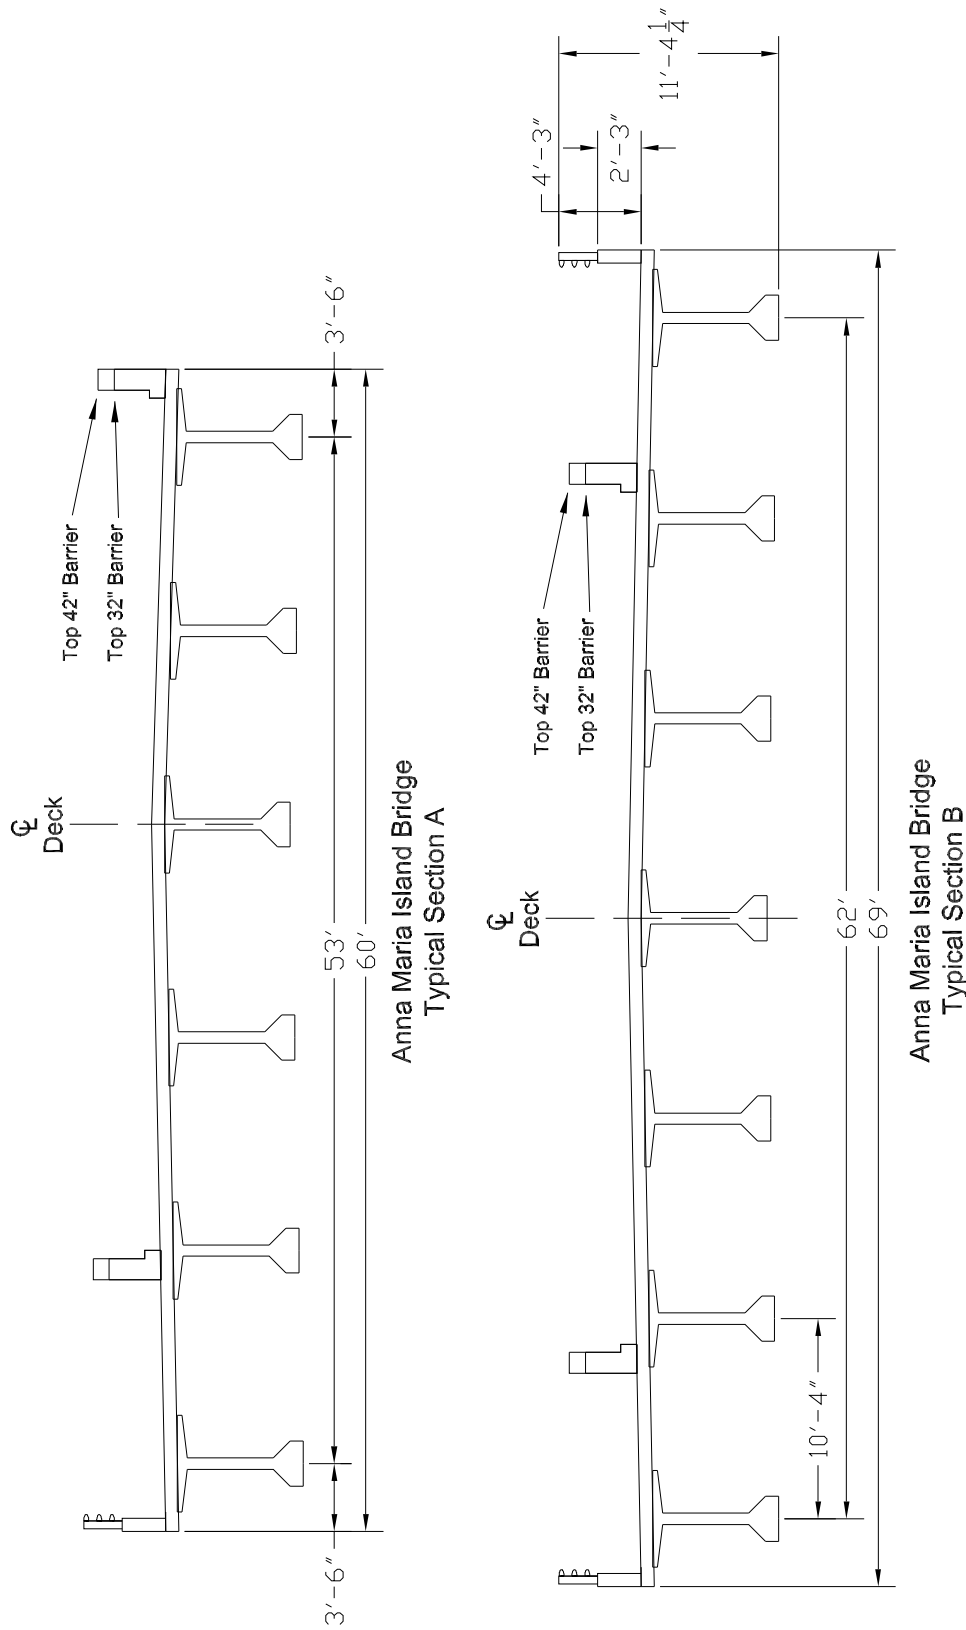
SECTION VIEWS OF THE BRIDGE DECK ALTERNATIVES
